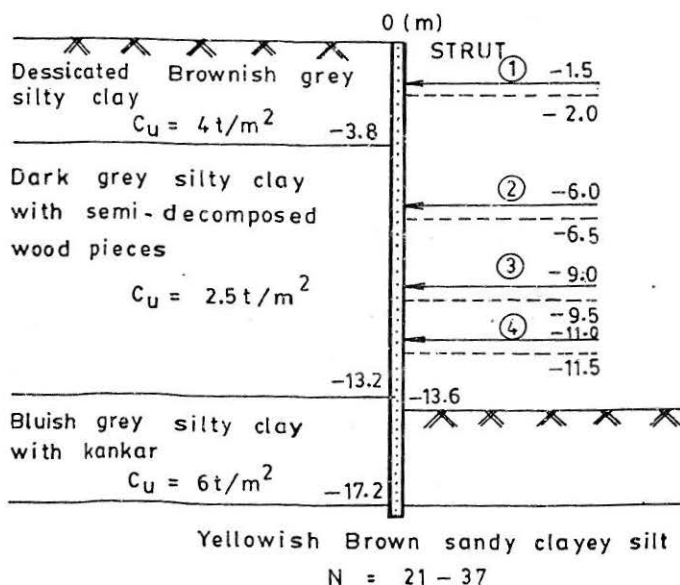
Typical Excavation Profile for Cut-and-Cover Construction with Diaphragm Wall and Struts
